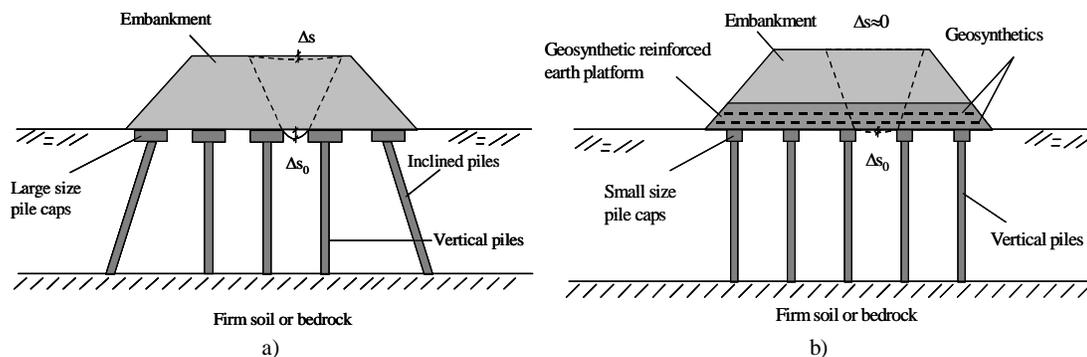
Pile supported embankments construction systems, a) Conventional pile-supported system (CPS), b) Geosynthetic-reinforced pile-supported embankment (GRPS)
